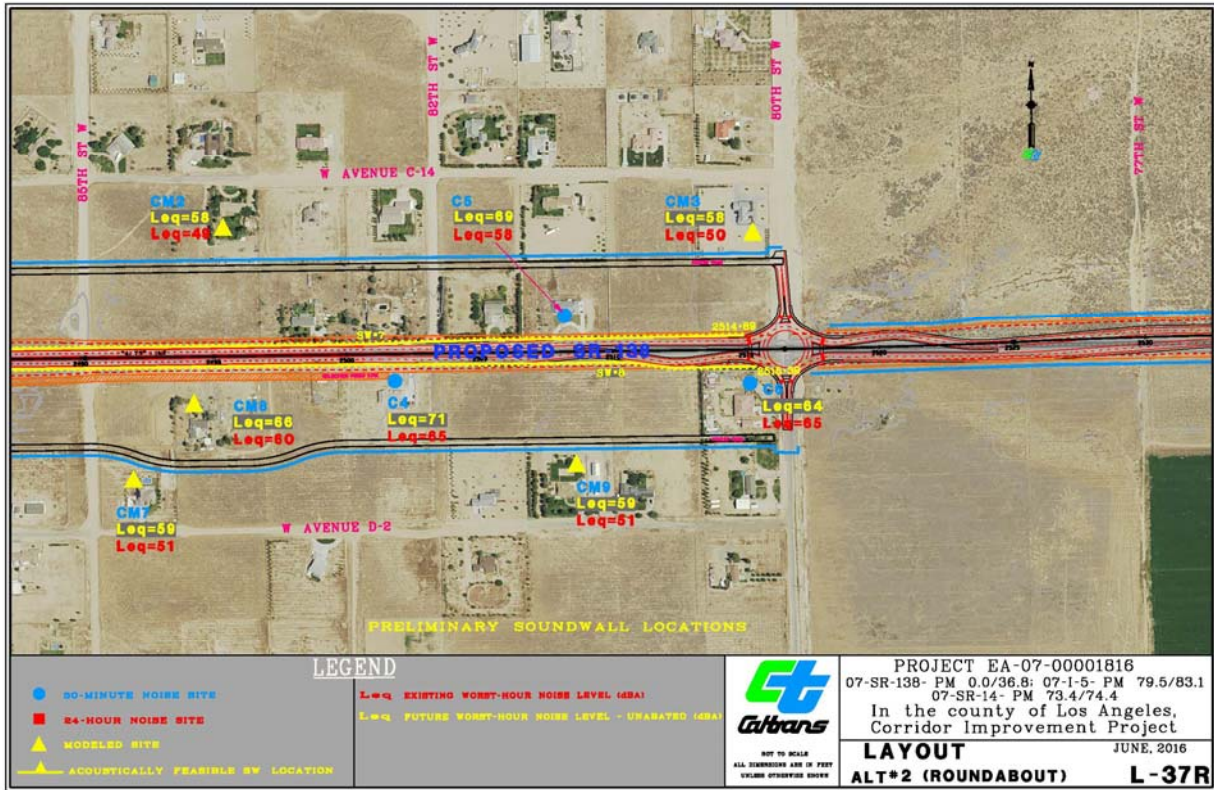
Alternative 2 (Roundabout) Soundwall Location – 7 and 8 (sheet 2 of 2)
